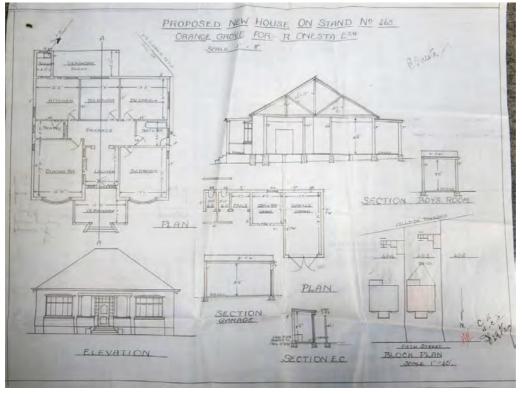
Plan for proposed new house on Stand 463, Orange Grove from 1930 Good example of three bedroomed single storey residence with corrugated iron roofing and centrally located front stoep
